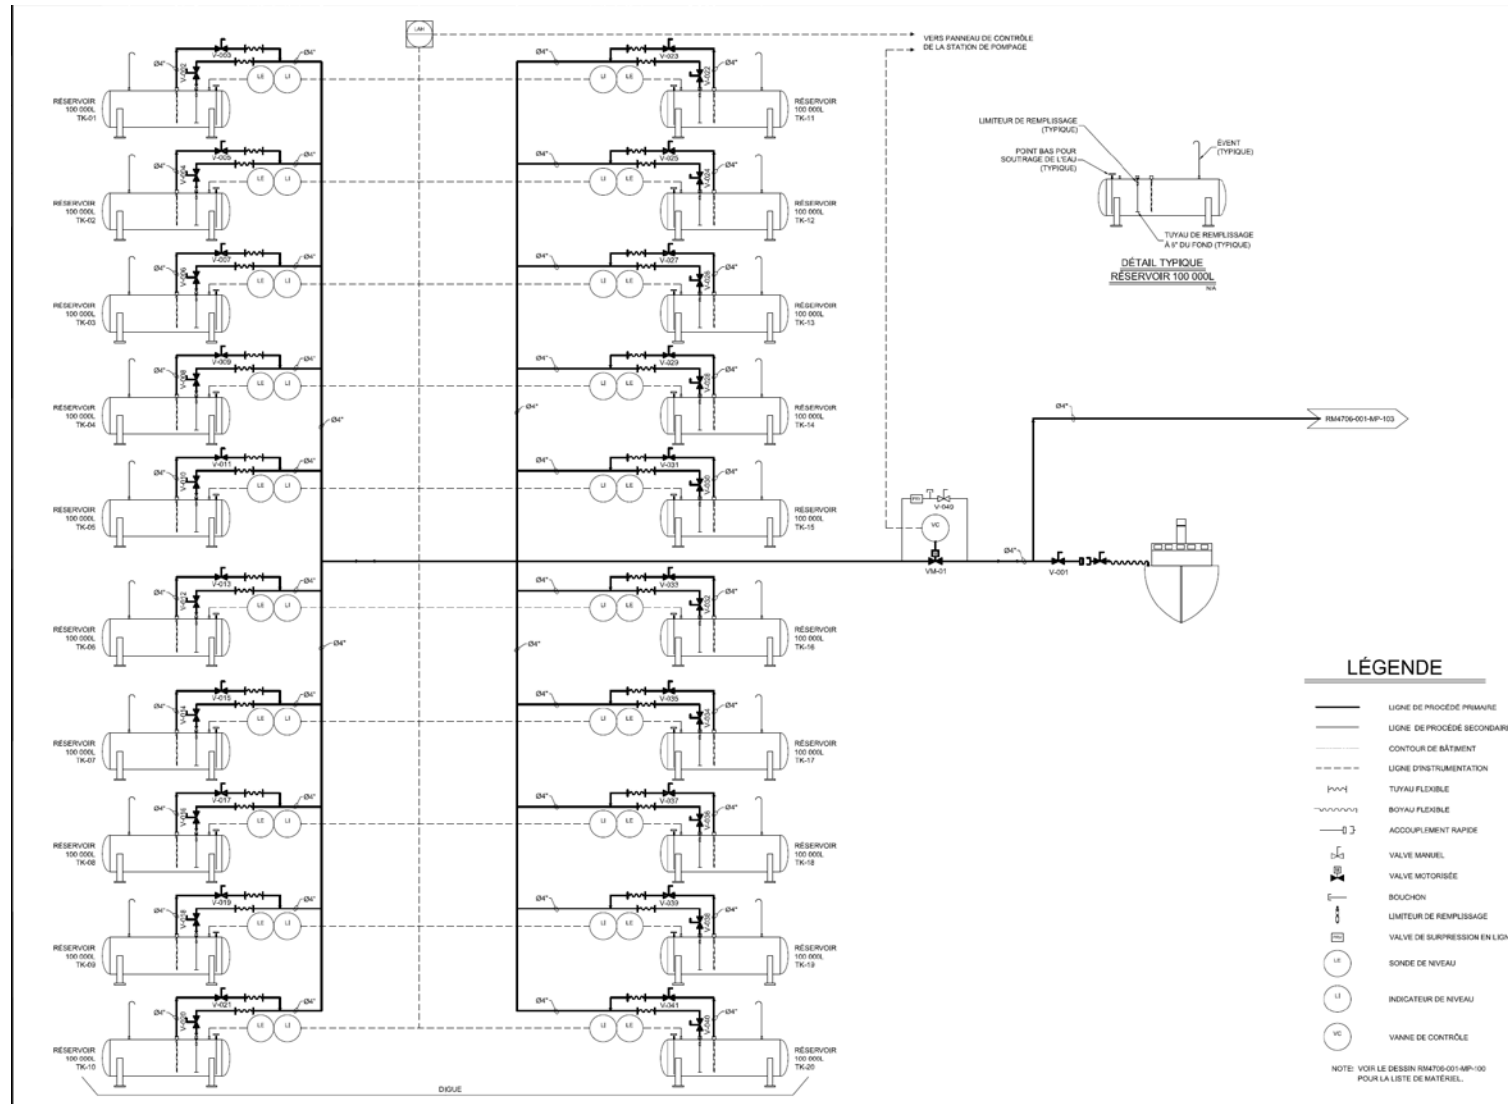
Baker Lake Marshalling Area Layout: Jet-A Fuel Storage Facility
